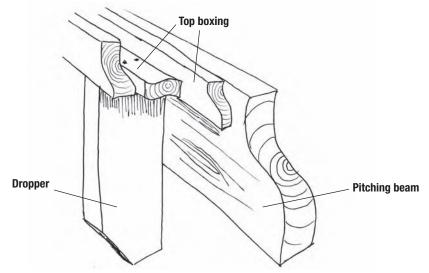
Dropped rolled head dropper joining the top boxing and pitching beam for infill construction
